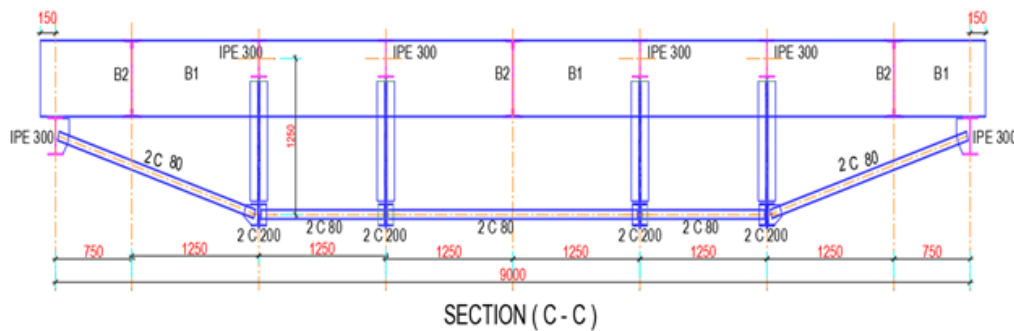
Section showing additional four trusses, two edge girders, and connecting beams
